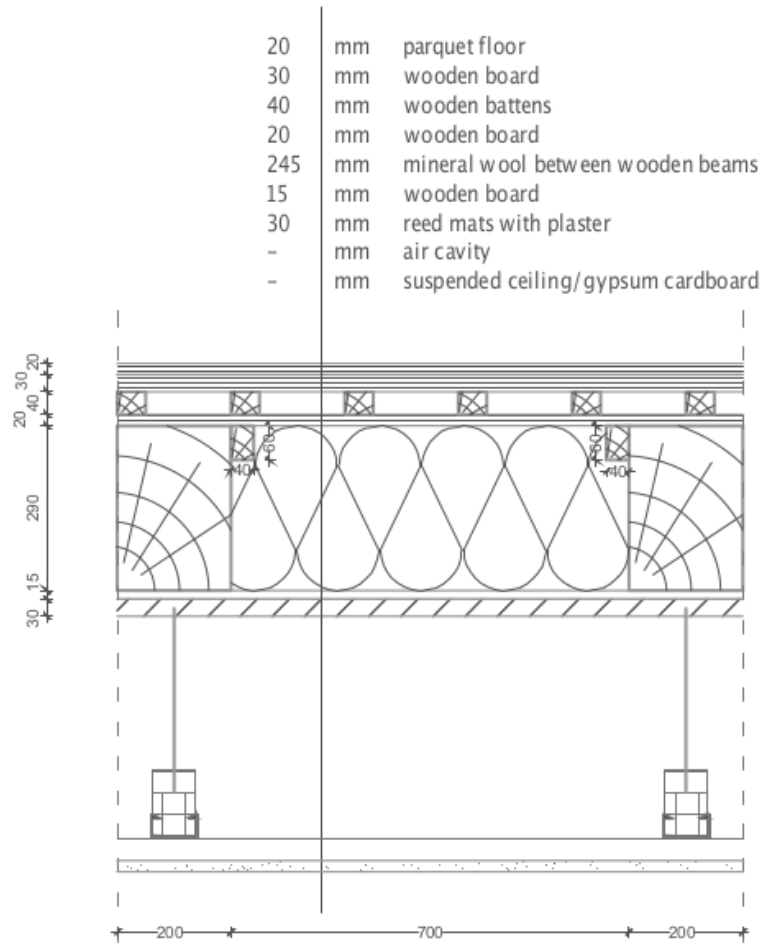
Non-refurbished construction (b); wooden beam floor separating the 2nd and 3rd level
